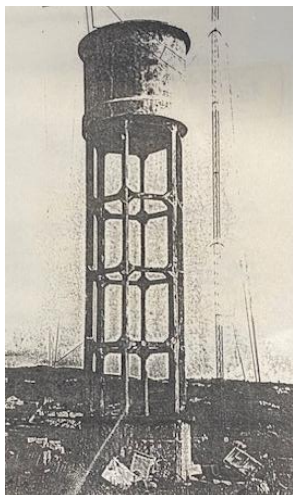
Elevated water tank exhibiting no damage to their structural elements
